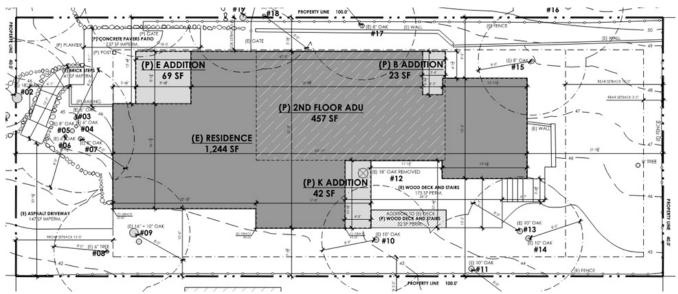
Site Plan. 8' root protection zones identified in Preliminary Site Assessment (PSA) shown in dashed (---) circles around trees. PSA identified that excavation within 8' of a tree trunk is not permitted.
